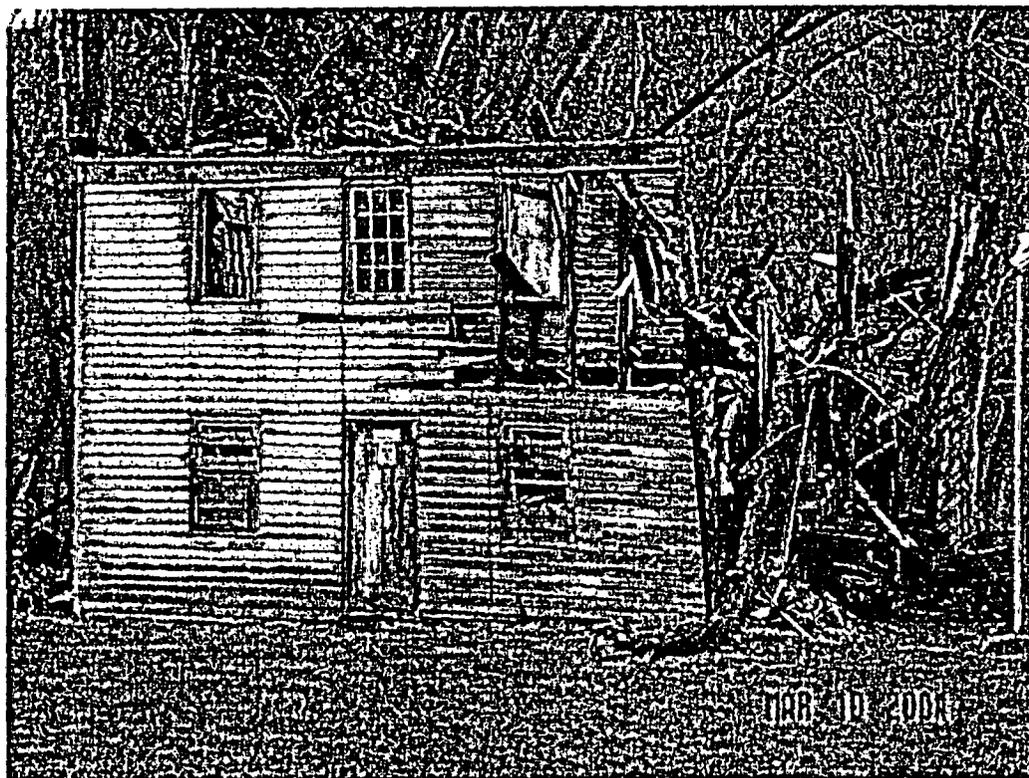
"Old House" after 1998 Fire and 2003 Hurricane *Isabel* Damage
